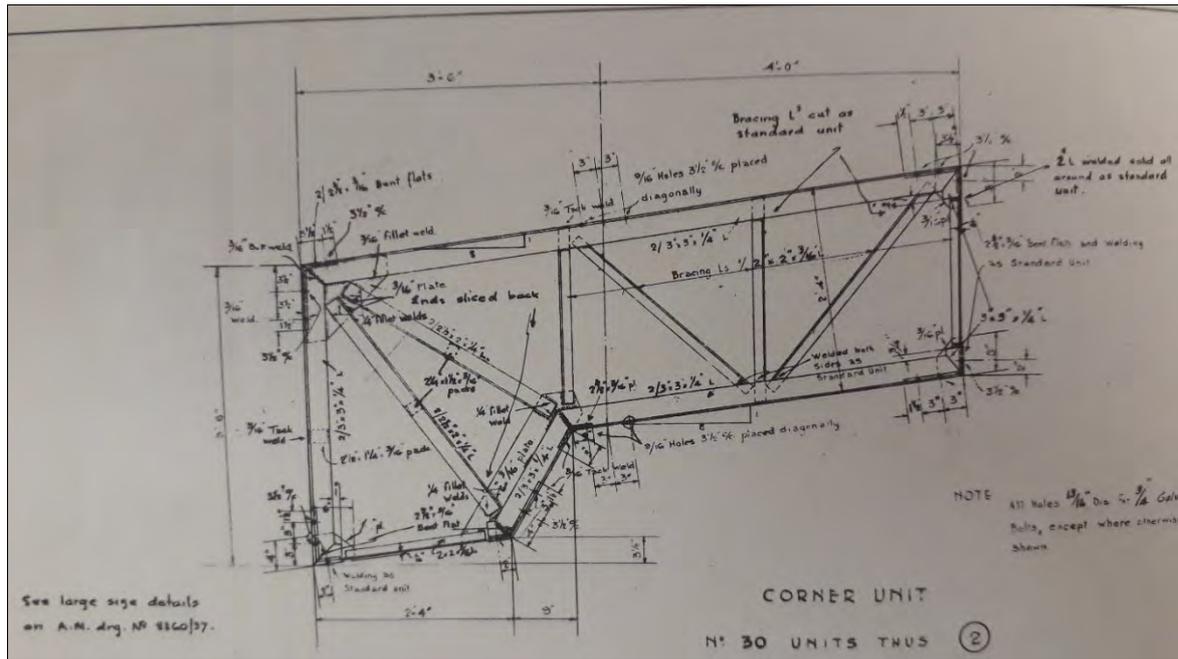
Plate YY. Corner Unit details (Work 44/37 and work 44/38)
